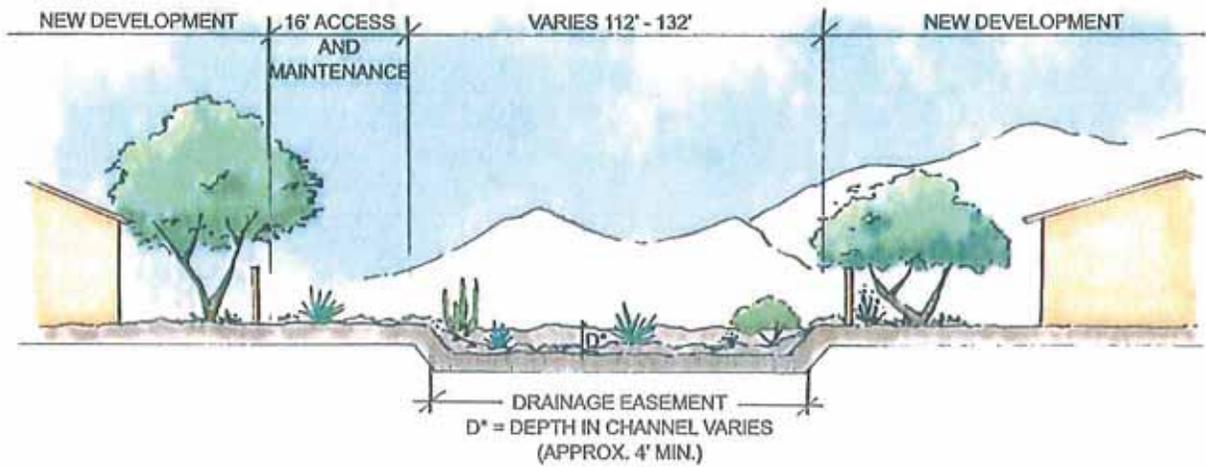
Typical Section C-C Levee and Existing Channel
